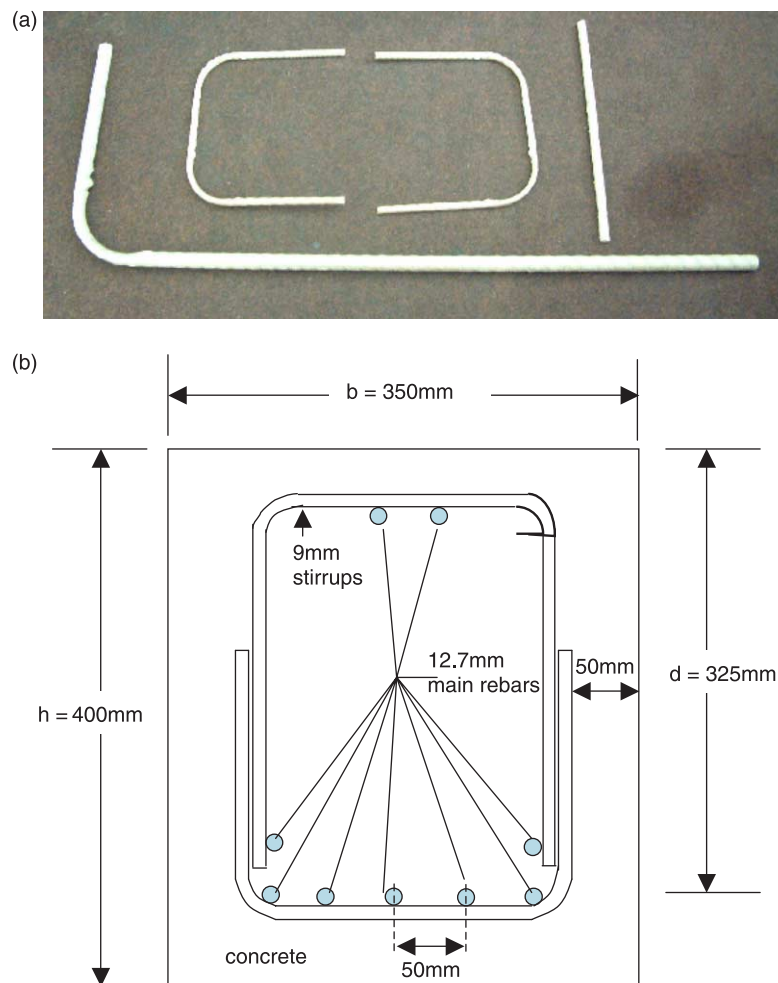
(a) GFRP rebar shapes used as reinforcement for control beam and beam 1. (b) Beam cross-section with reinforcement arrangement.
